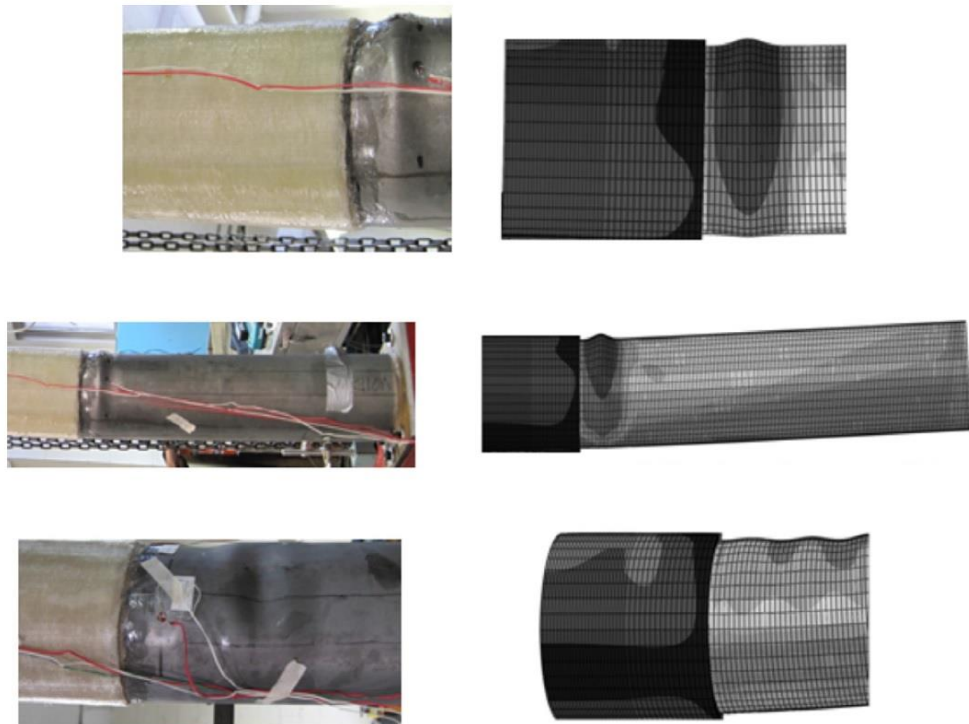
, Comparison of buckling shapes between full-scale testing and finite element modelling (Shouman & Taheri, 2011)
